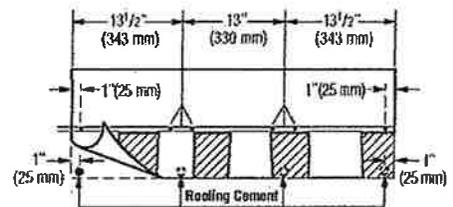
Use six nails and four spots of asphalt roofing cement on steep slopes.
